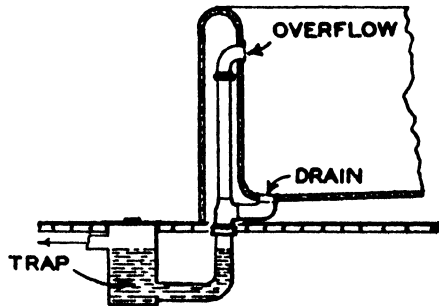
A cross-section of a bath-tub trap. This type of trap is called a "non-siphoning" trap.
